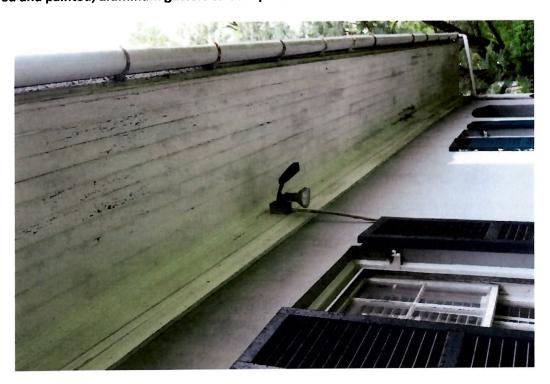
08/05/19. Side (east). Project area. Detail of shutters to be restored and painted; wood ceiling, trim, and molding to be repaired and painted; stucco to be repaired and painted; aluminum gutters and downspouts to be repaired.
